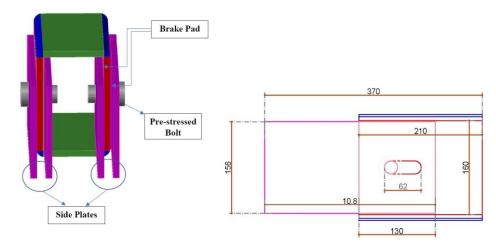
(a) Schematic 3D shape of the FBP damper, (b) Geometry and details of section view of the damper (dimensions are in mm).
